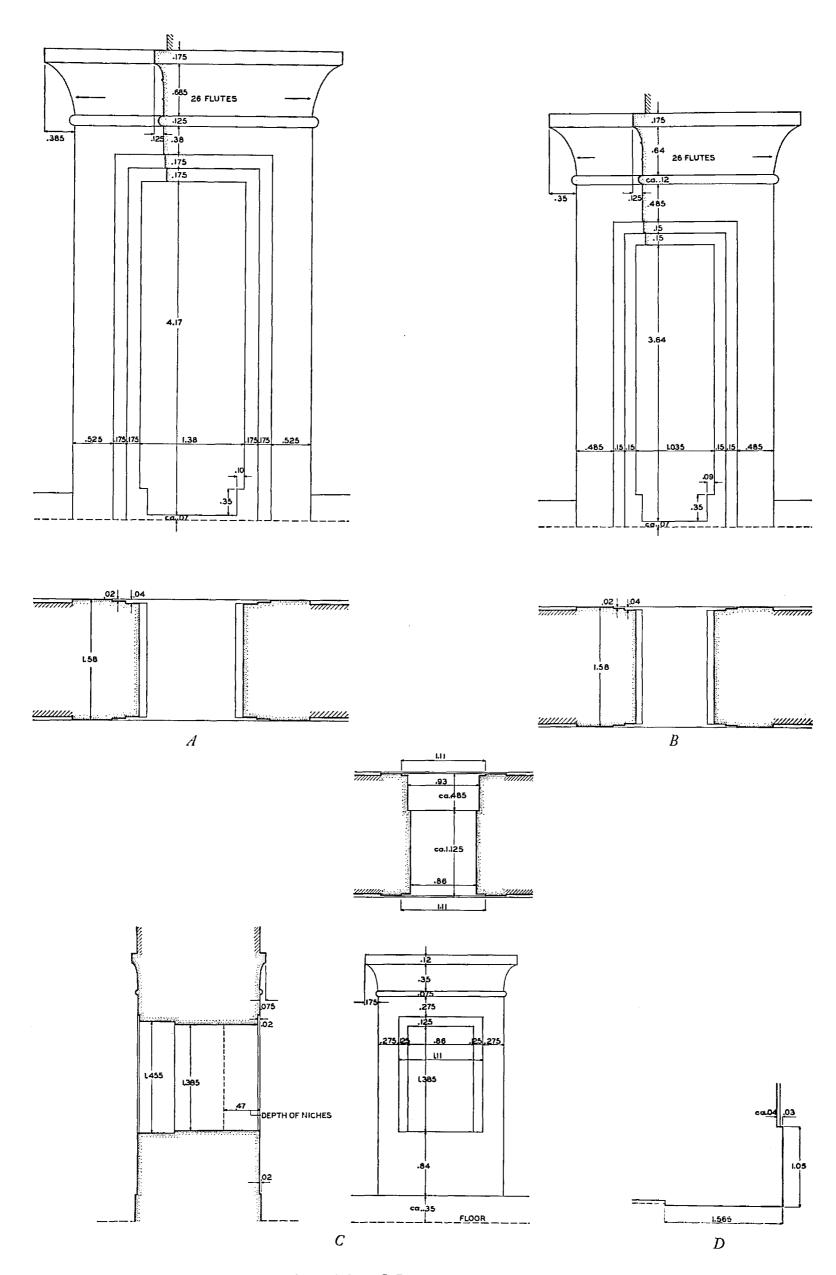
Harem. Architectural Details. Scale, 1:50. A-B. Diagrams of Doorways to Main Hall and Guardrooms. C. Diagrams of Windows and Niches in Main Hall and Portico. D. Plan of East Anta of Portico
